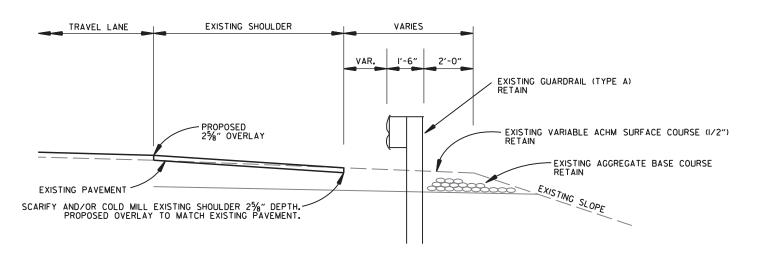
DETAIL FOR PAVEMENT TRANSITION AT END SPRINGHILL ROAD
